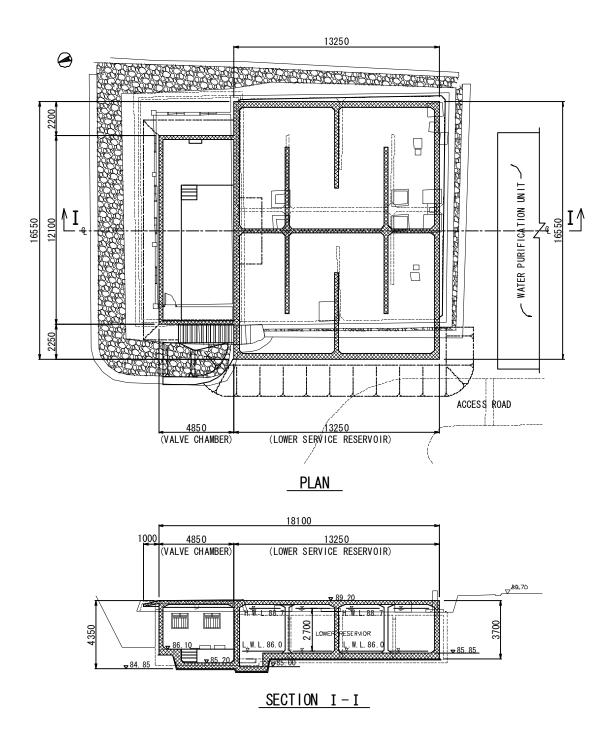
Basic Plan of the Lower Service Reservoir
